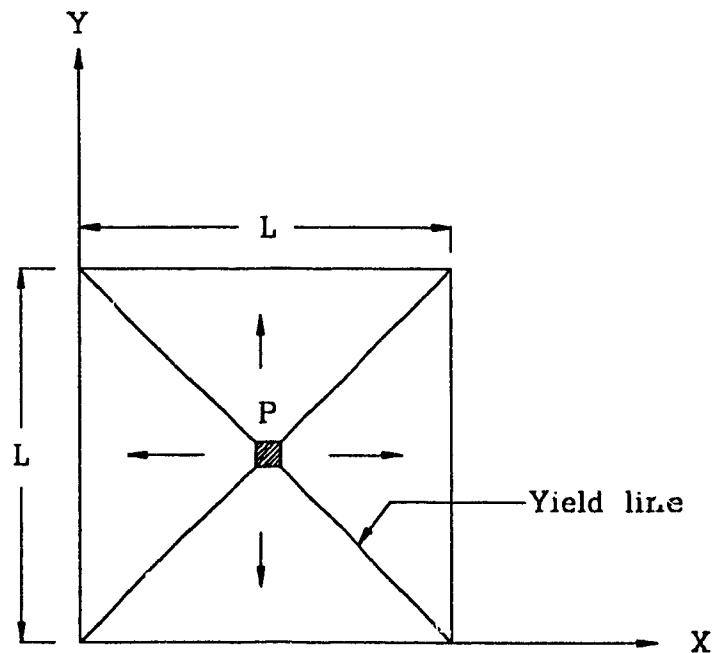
The pattern of cracks for a slab on the verge of collapse due to a central concentrated load 'P'
